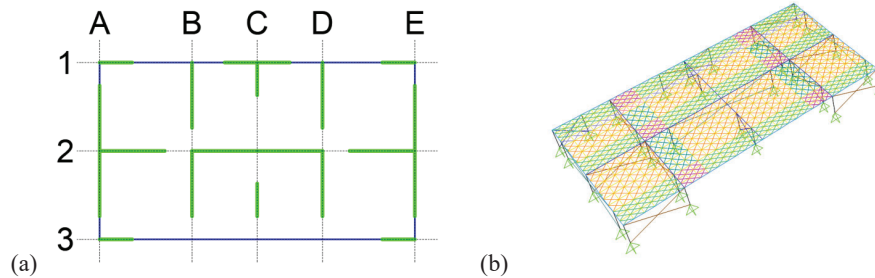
Case study 1, (a) Building plan and (b) ETM model
